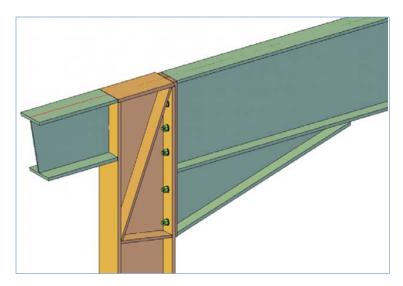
SLOPED STIFFENER AND STANDARD STIFFENER 3 INSERTED
